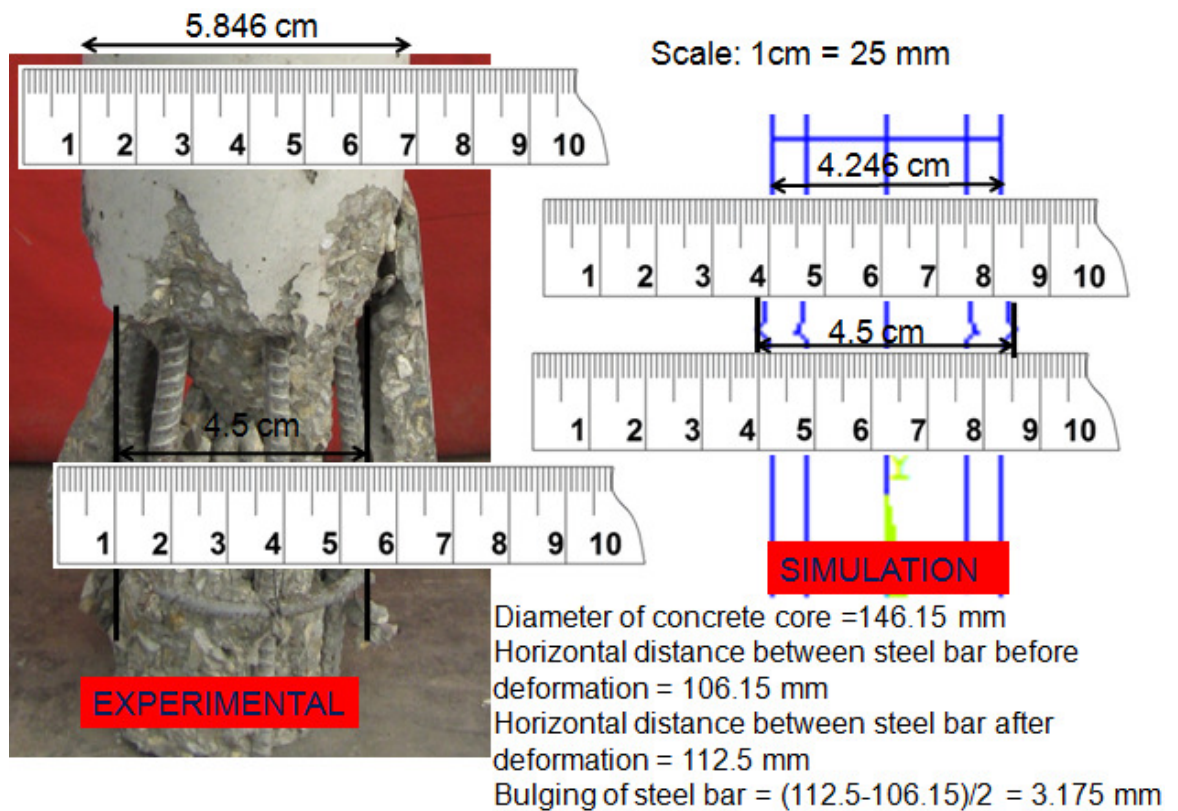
Measurement of bulging of steel bar of deformed RCC specimen “160P5BRC30”
